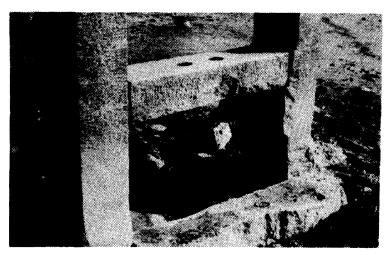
Detail from the Sluice with the Shorter Columns at the Vijayanārāyanam Reservoir. Note the two apertures on the horizontal slab.
